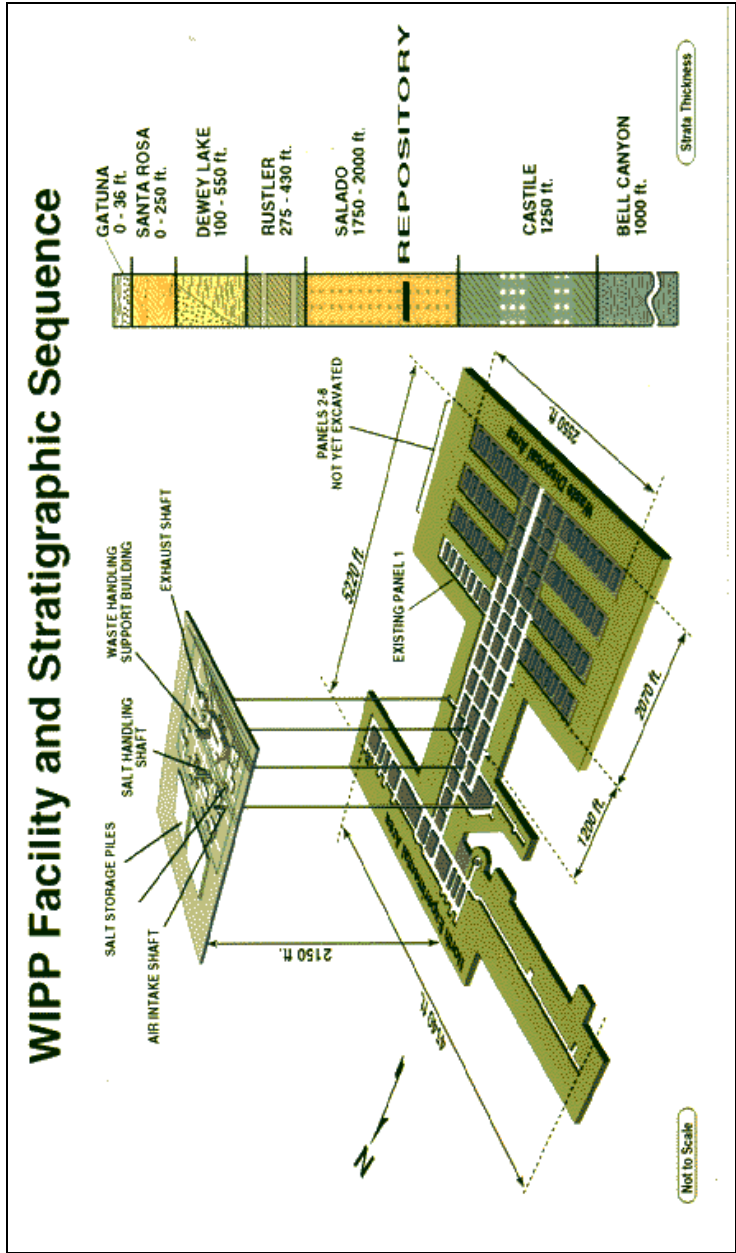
Disposal rooms excavated in the Salado Formation, about 70 m thick.
